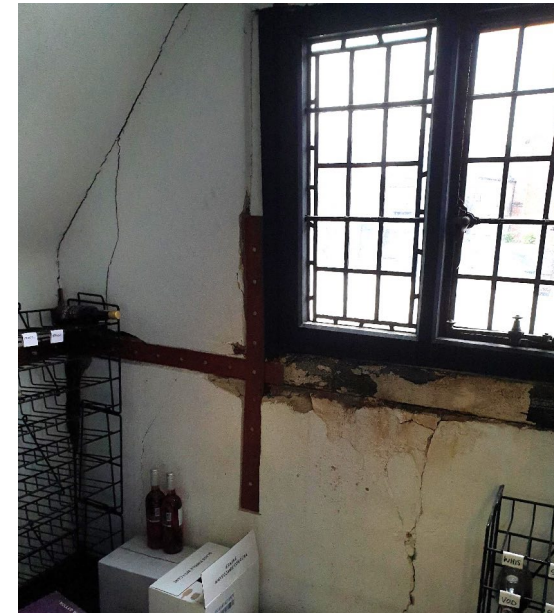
Temporary steel strapping to inside of Gable Wall 3A/3B as an emergency repair to halt ongoing structural failure.
